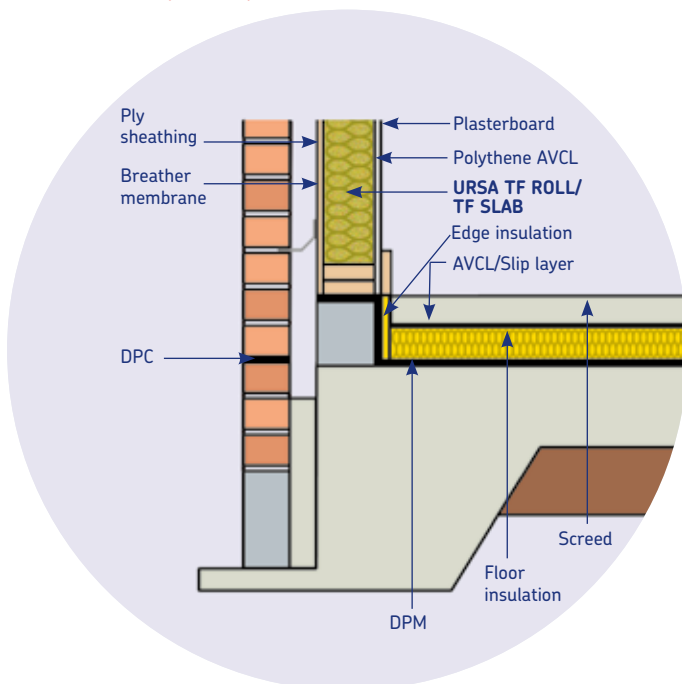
Wall/Floor Junction Insulation Below Slab
